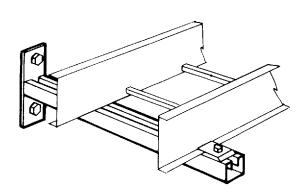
A SINGLE STRUT CANTILEVER BRACKET
